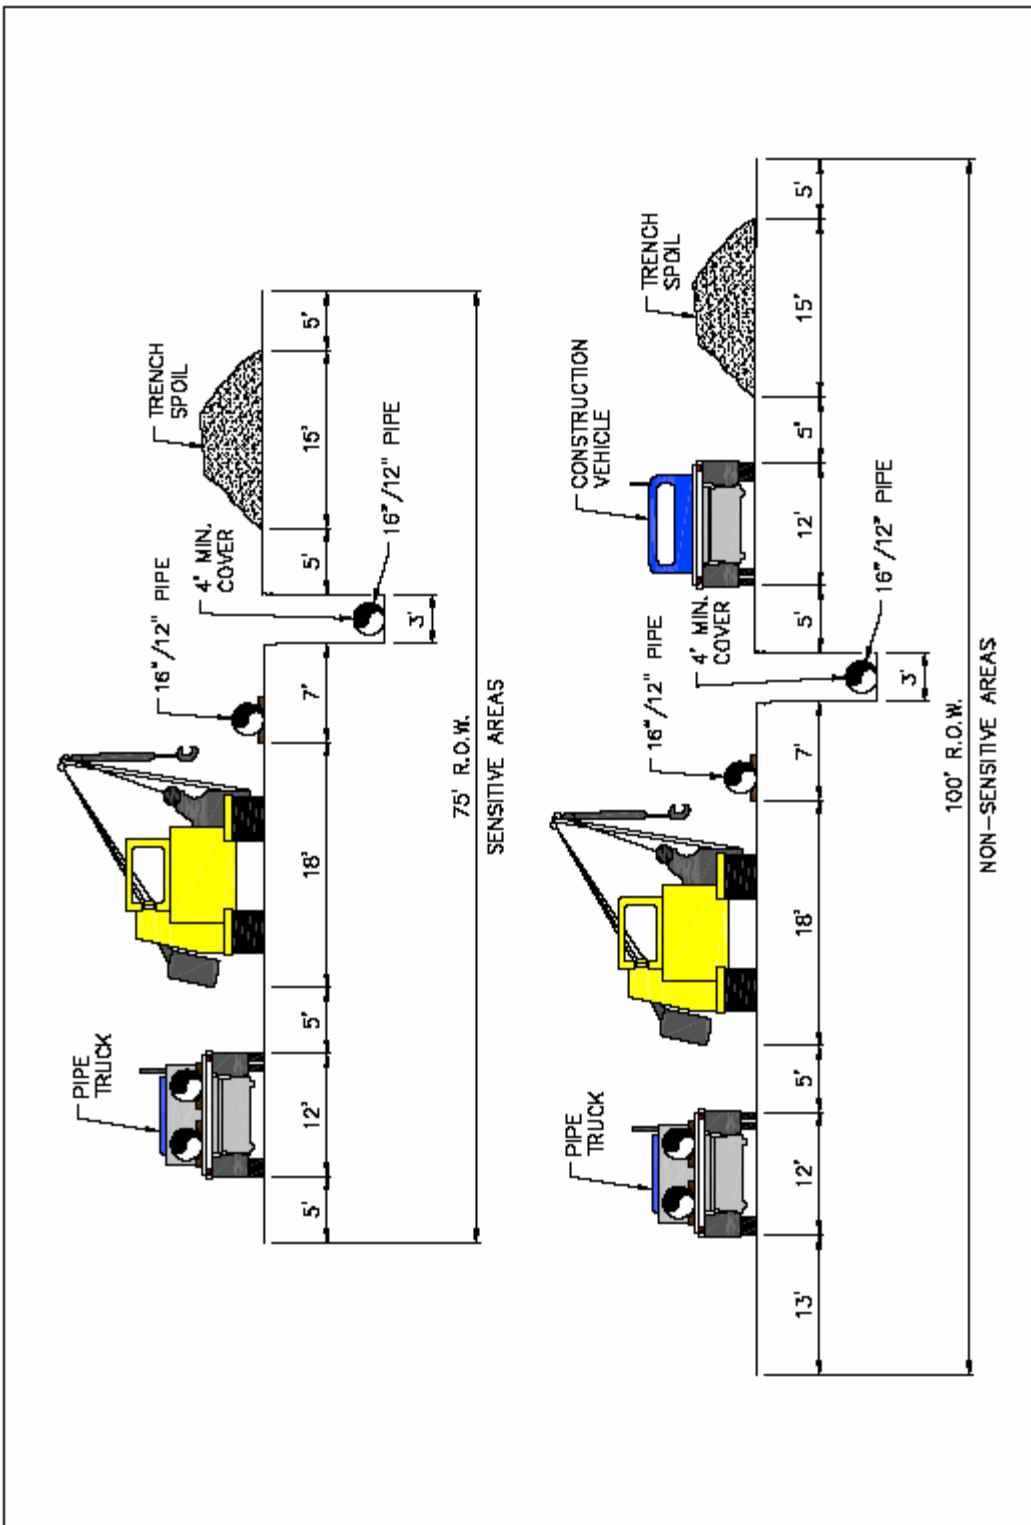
Temporary Construction Workspace in Rural/Desert Areas.
